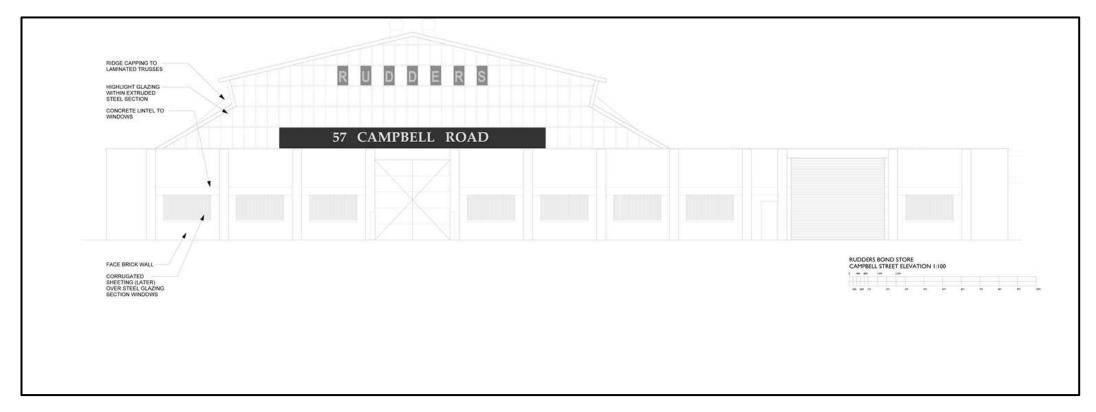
Elevation plan of the front façade. (Source: The Archivist, Drawing No RBS\_MD-02, Issue 21.07.16).
